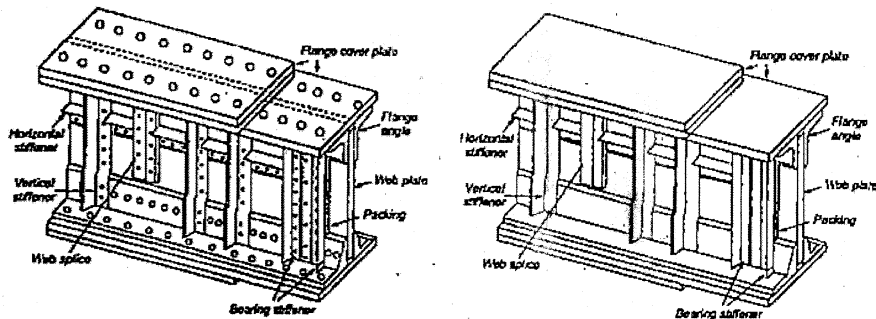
Typical elements of a riveted/bolted plate girder
